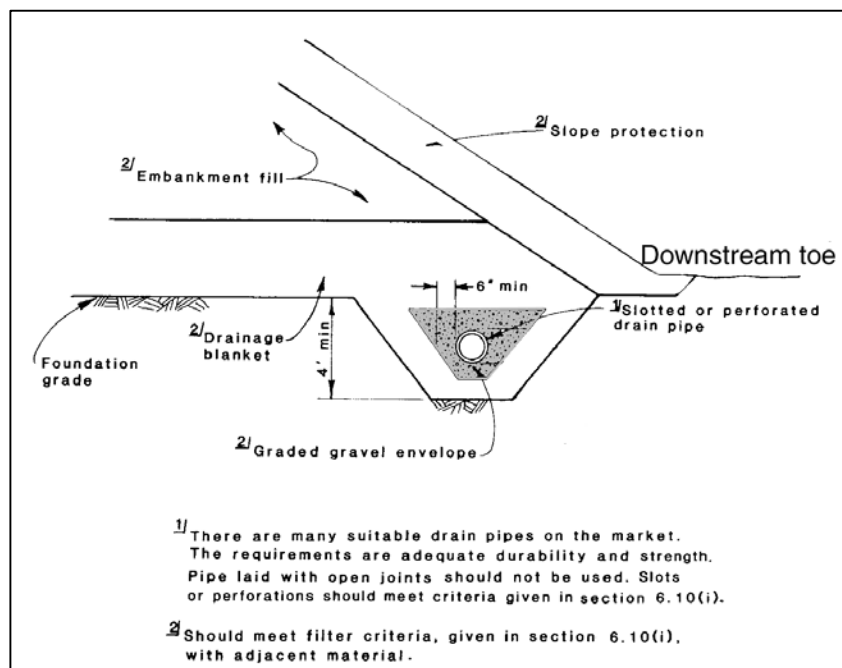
Typical toe drain detail (adapted from the Bureau of Reclamation [1990]; footnotes refer to the source document.)
